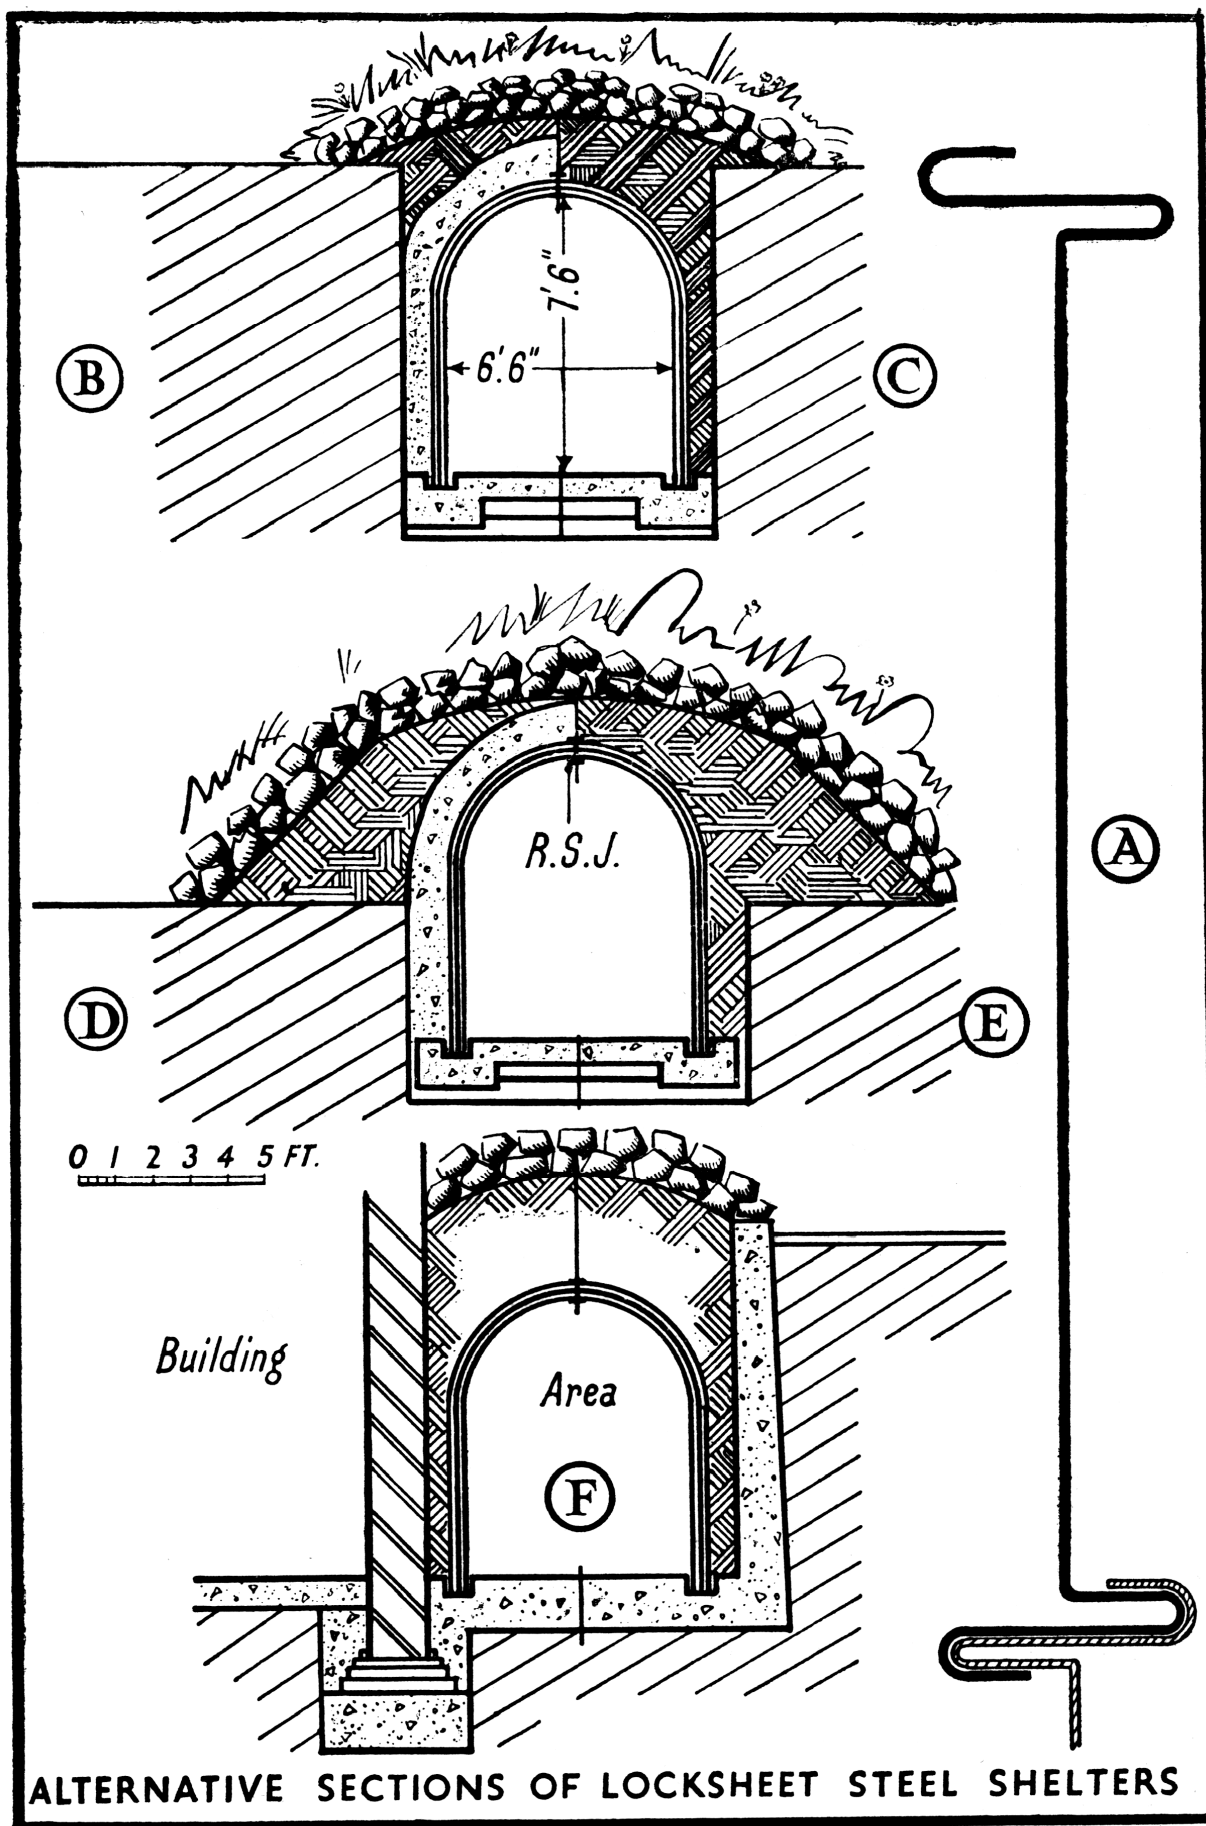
Costain's locksheet steel shelters. A, enlarged section of locksheet steel; B, constructed in deep trench and covered with concrete, earth and rubble; C, constructed in deep trench and covered with earth and rubble; D and E, partly underground, and F, in area of building.
